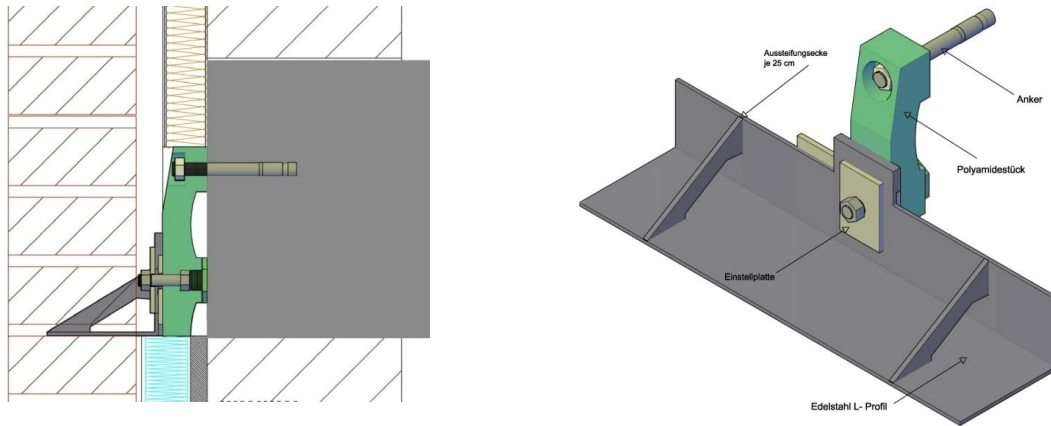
Consol-Design installed VIP insulation system, section and 3D
